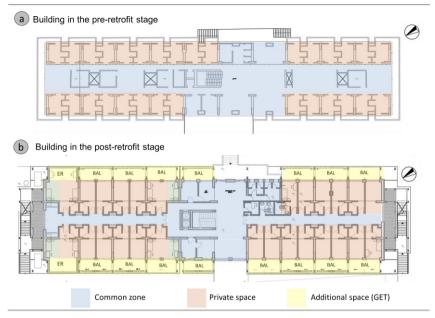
Plans of the ground floor, before (a) and after (b) the renovation.
